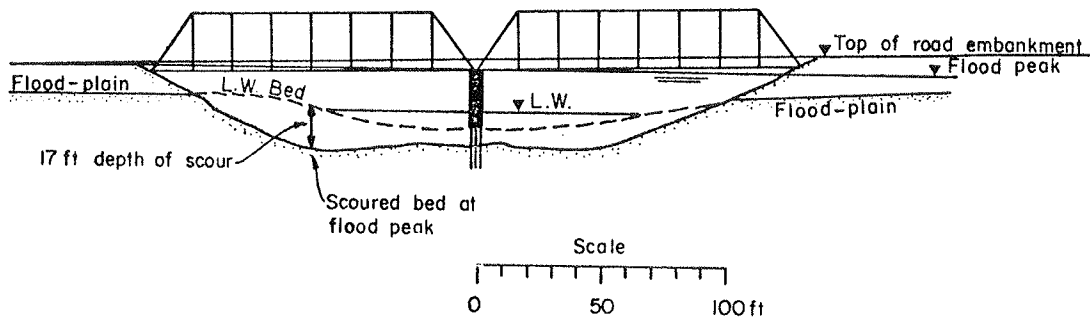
Soundings at a bridge, showing an example of general scour across a waterway opening resulting from the constriction of a flood through the opening.
